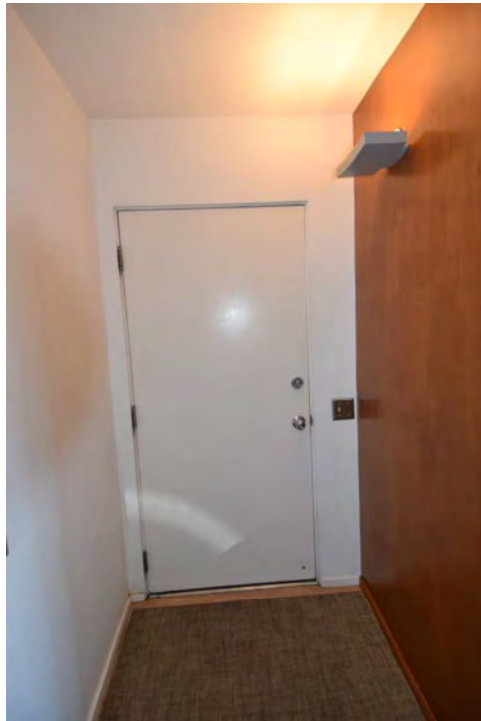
Interior entry vestibule with original light switch next to the door. Camera facing east (Source: ESA 2021)
